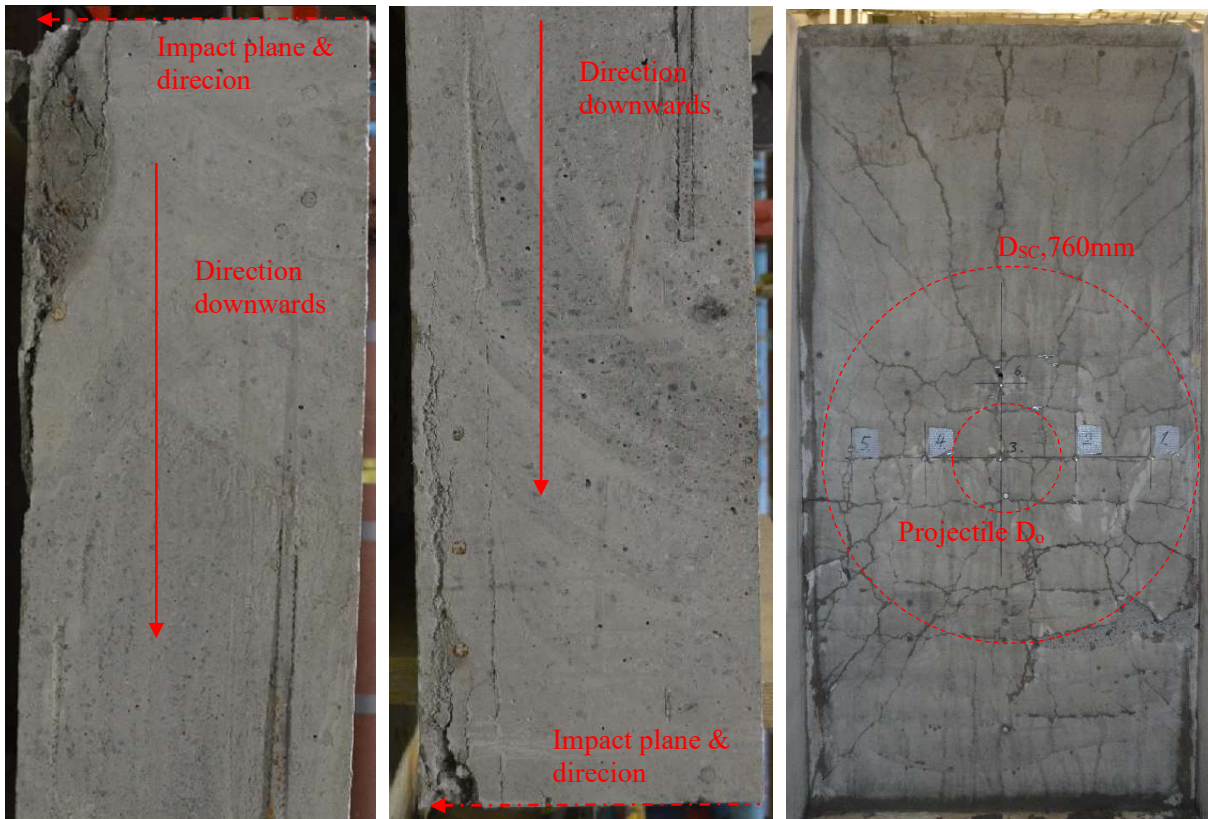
Left: Bottom half of the left support wall. Centre: Upper half of the left support wall. Right: Rear surface of the impacted wall.
